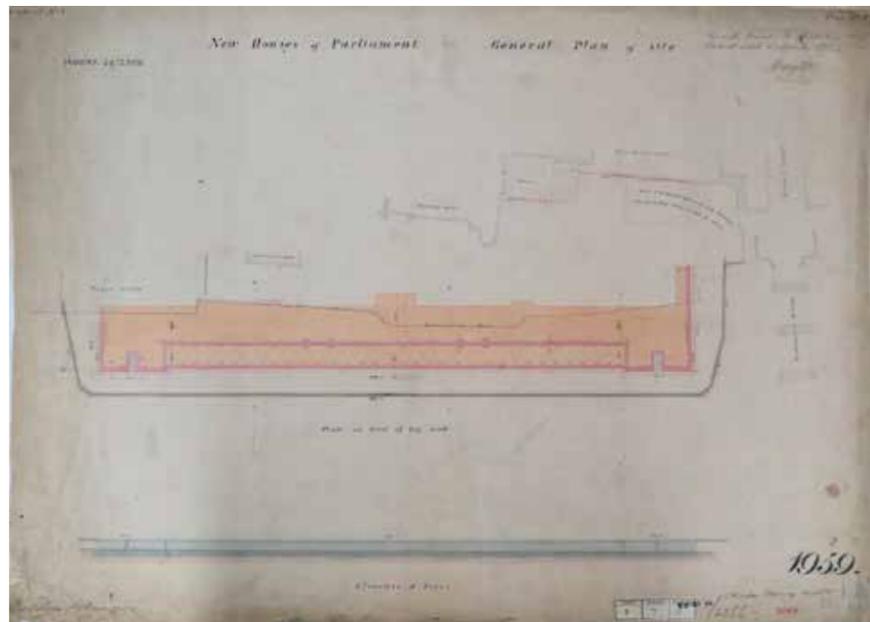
Charles Barry's plan for the embankment in front of the Houses of Parliament
